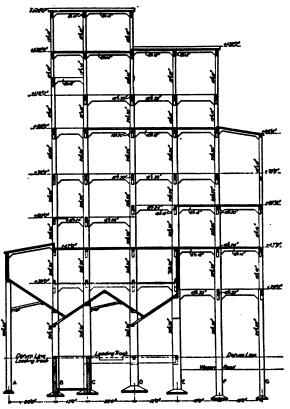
d. Transverse Section 4-4; Taylor Reinforced Concrete Breaker.
